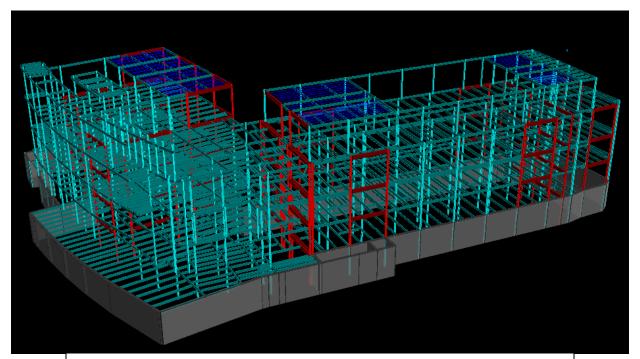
RAM 3-D View of Structural System with Lateral Bracing Highlighted (Northwest corner)
